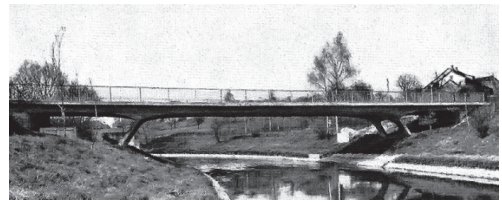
The Glatt Bridge 1 (Rösli et al. 1963).
